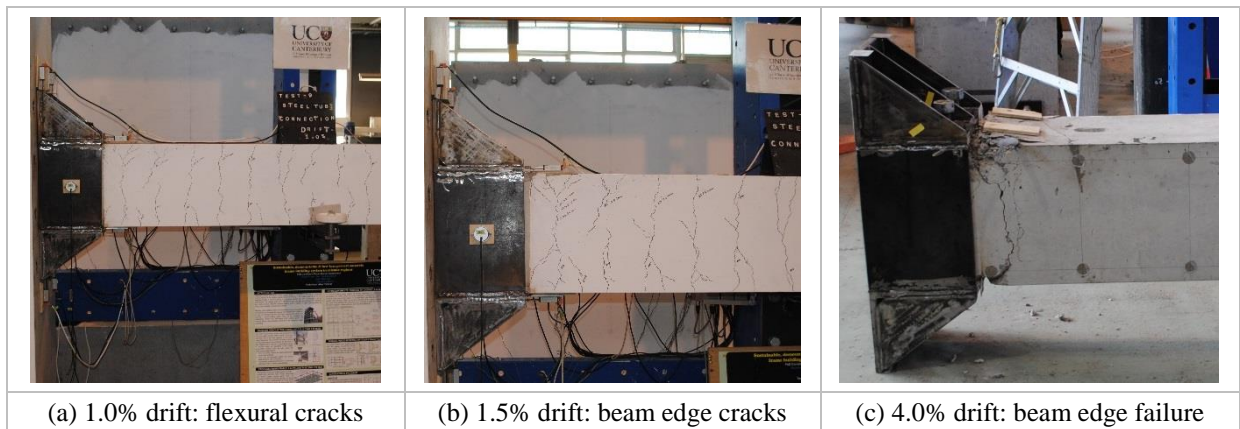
Typical damage states to the beam with tube connection at different drifts (Test-T1)
